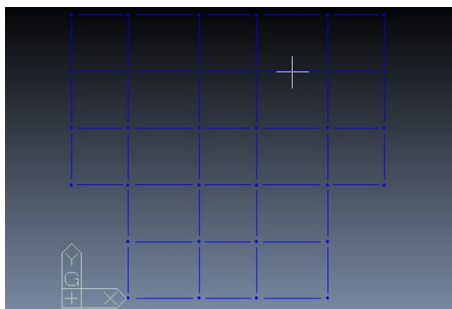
plan of the building (Mallika.K1 ,Nagesh Kumar.G2)
